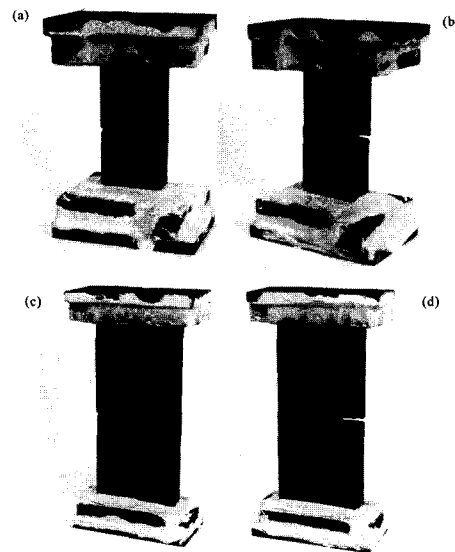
(a) Front and (b) back face of medium size specimens after compression (c) Front and (d) back face of large size specimens after compression.
